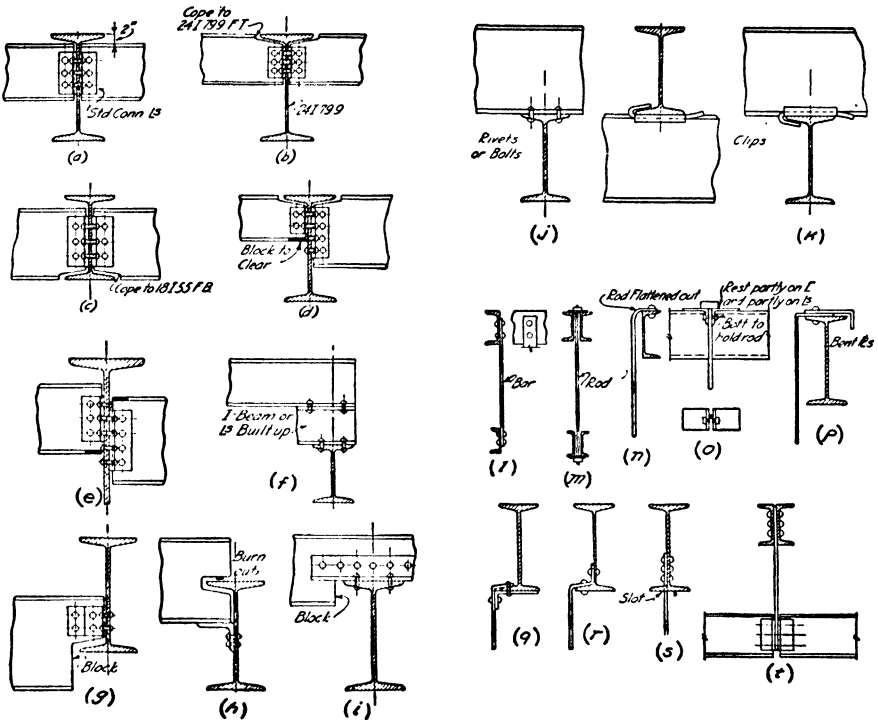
Steel Beam Connections. (a) under girder flange; (b)&(d) tops flush; (c) bottoms flush; (e) offset opposite beams; (f) built-up bearing; (g) blocked, dropped beam; (h) reinforced, blocked, elevated beam; (i) riveted top bearing; (k) clipped top bearing; (l) to (t) hanger connections.
